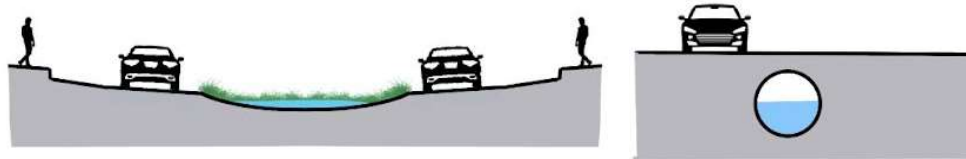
Typical section of Proposal of Retention Boulevards (Left) and Burst Pipe Roads (Right)
